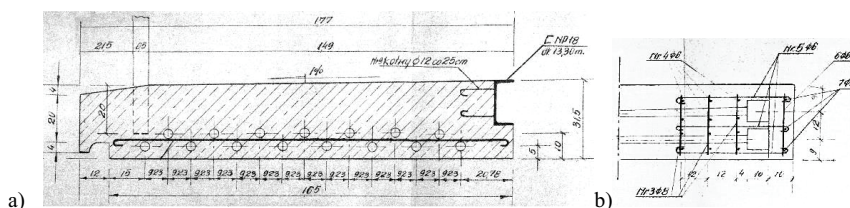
Sosnowica – working footbridge a) cross-section of the slab with the arrangement of post-tensioned tendons b) detail of the slab reinforcement at the anchorage.
